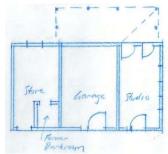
Floorplan of garage built 1956, sketched by Geoff Ashley (2016, p32).
